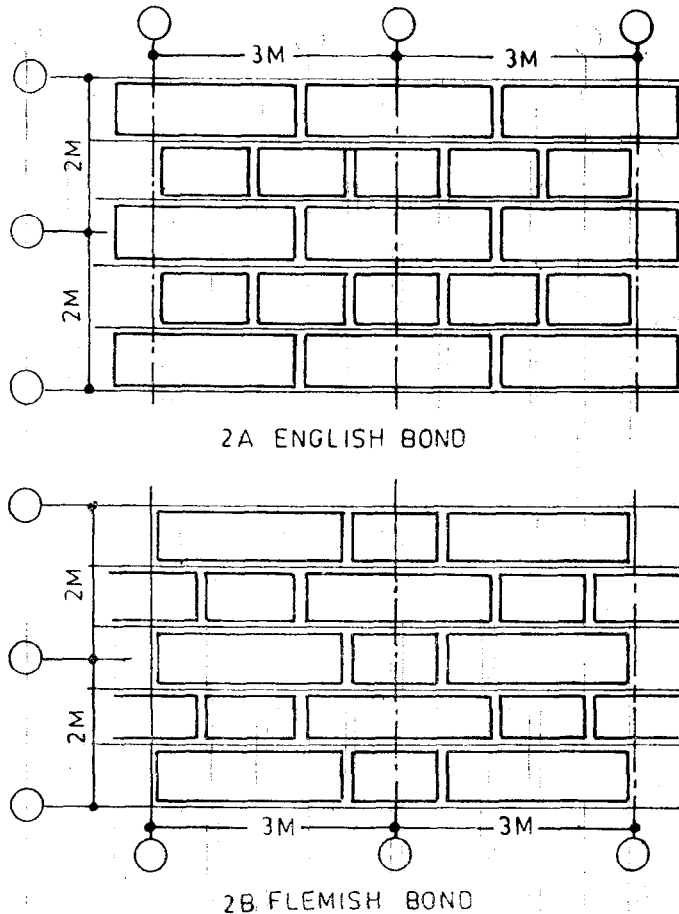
BOND ARRANGEMENT FOR NON-MODULAR BRICKS
